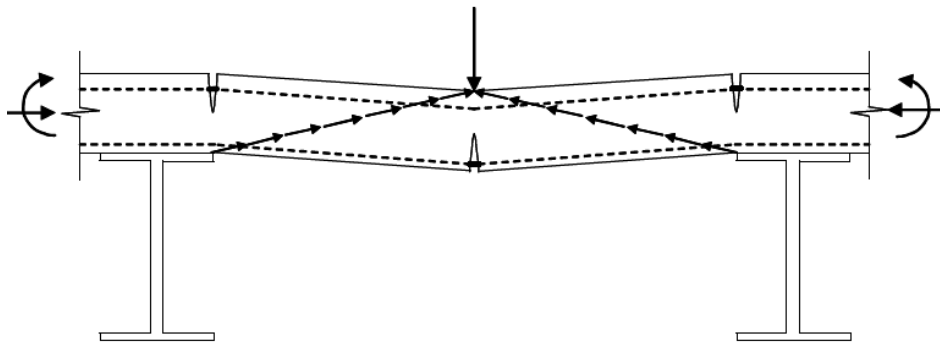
Arching Action in Transversely Spanning Bridge Decks
